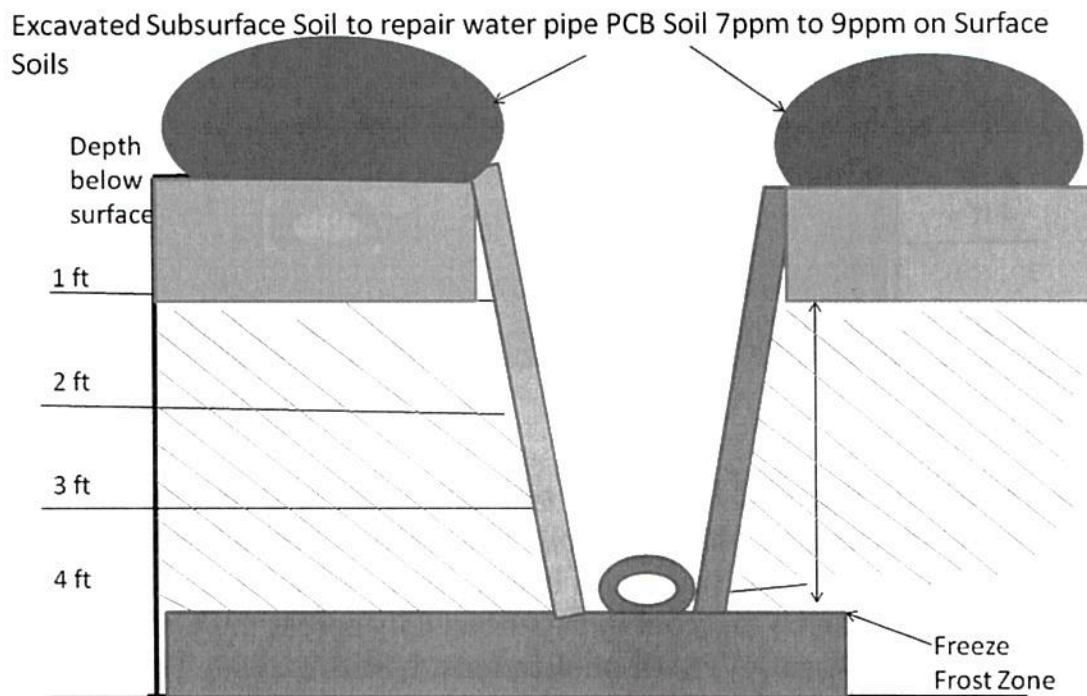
Resident Excavating to Repairing Busted Water Pipe
